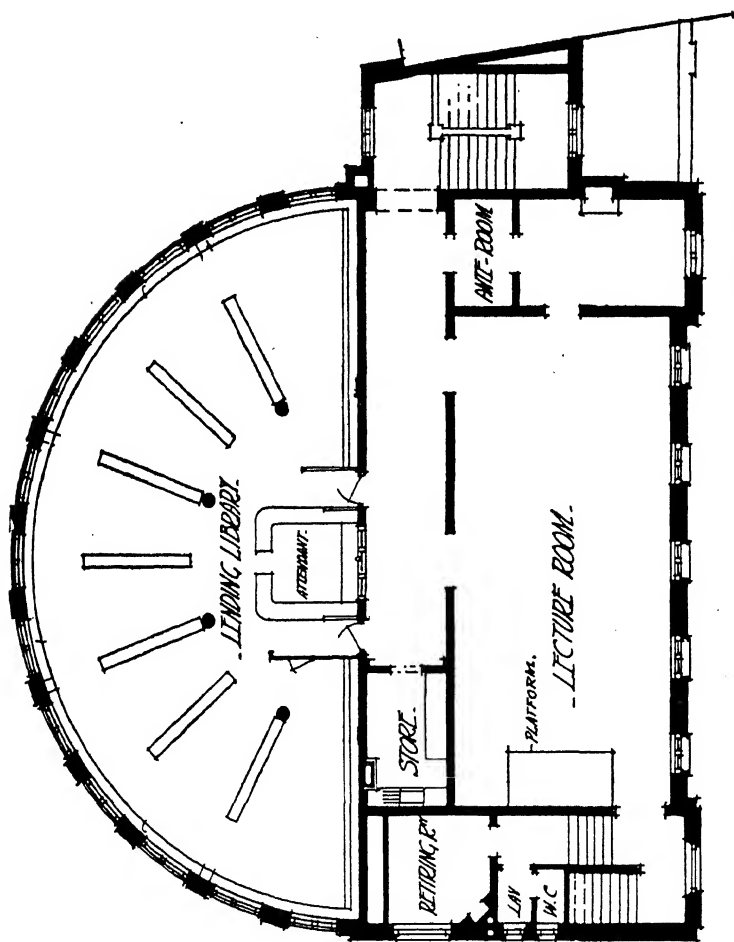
North Branch Library, Islington First Floor Plan (Section 174).
